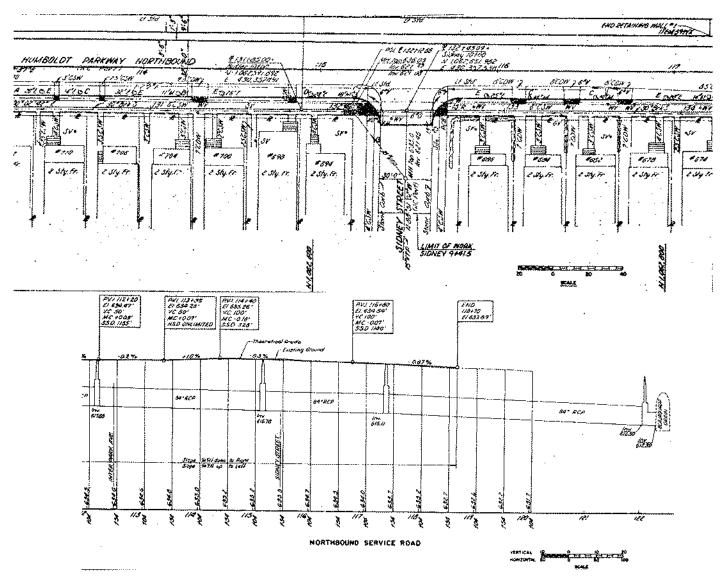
Existing Humboldt Pkwy Sewer Plan and Profile
